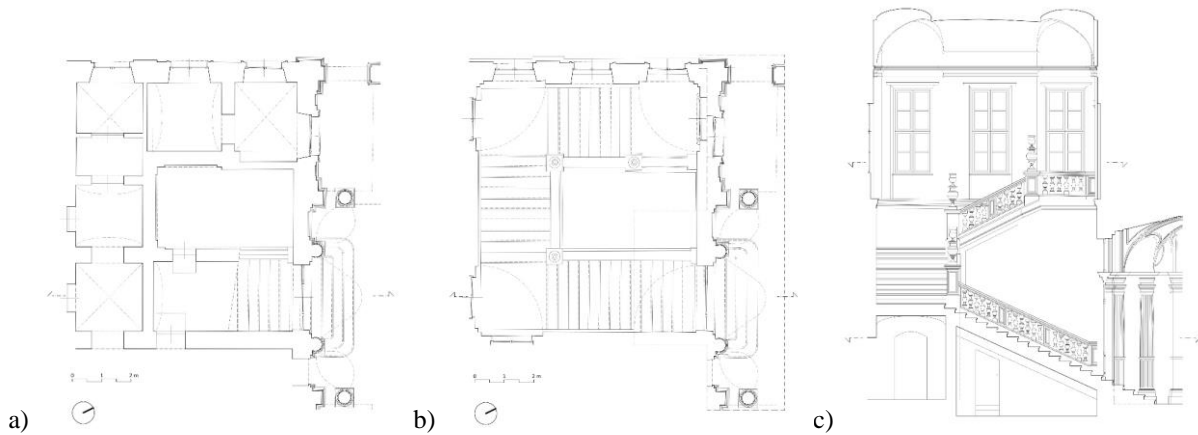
CAD drawings: a) Ground-floor plan; b) First-floor plan; c) Section. Source: Natta (2022)
